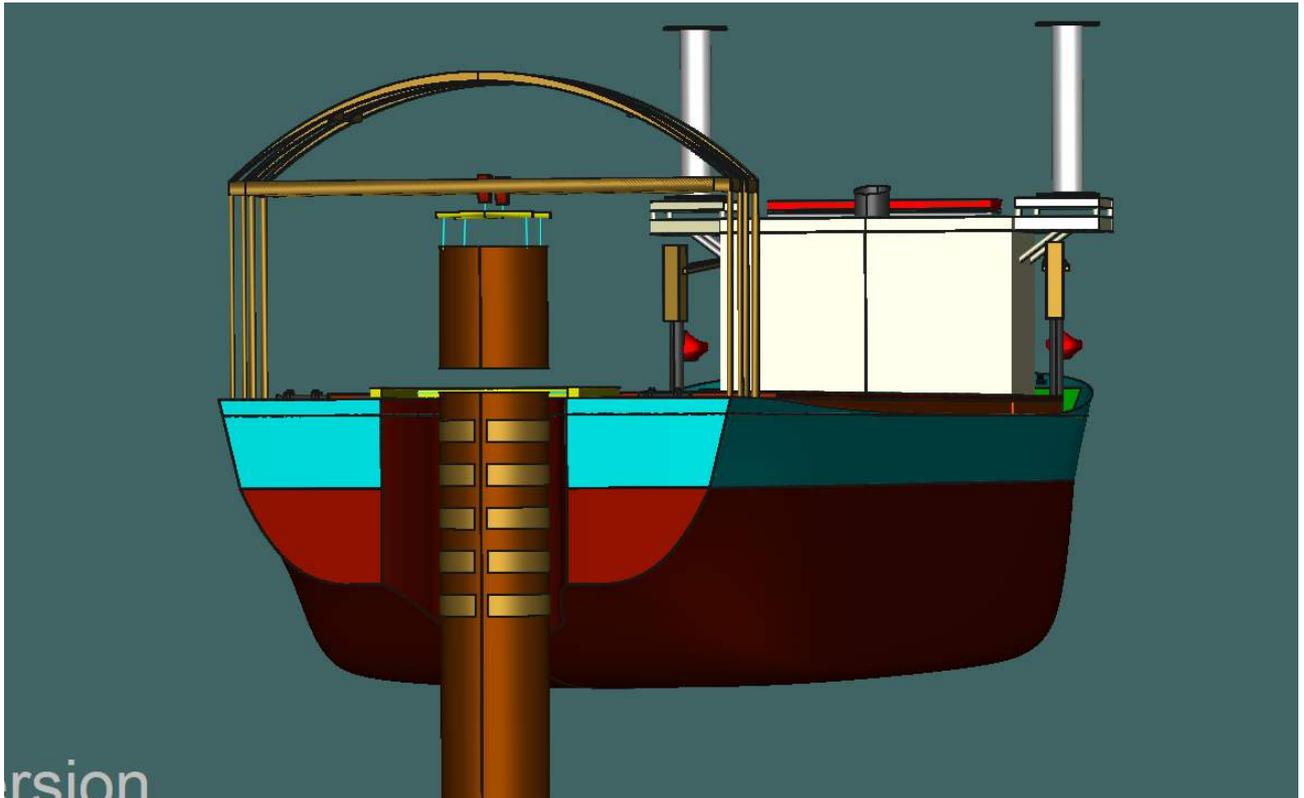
Lifting and Transferring the Cut section of Monopile (Perspective view)
